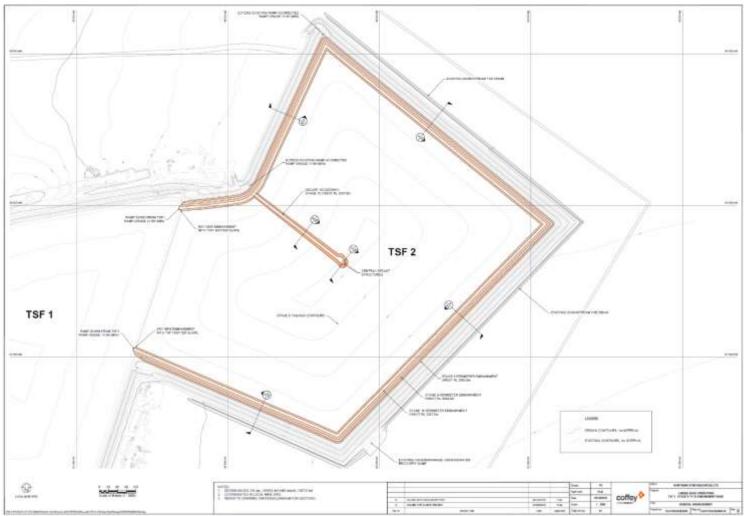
Jundee Gold Operations – TSF2 – Stage 9 to 10 embankment raise – General arrangement
